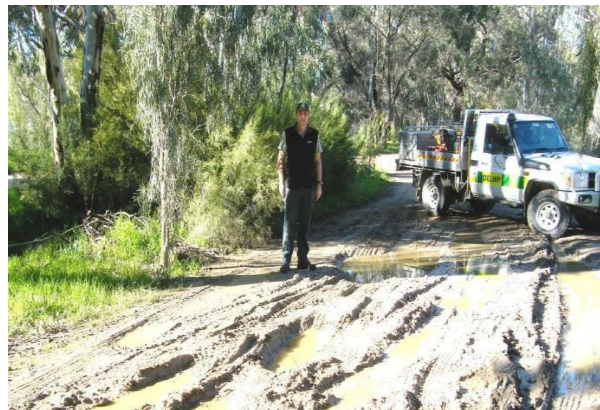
Damage from illegal woodcutters to a Fire Access Track.
